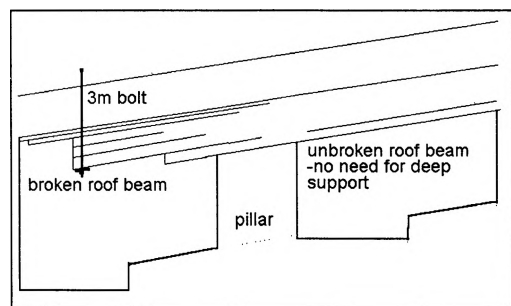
Schematic cross sections showing broken and unbroken beam geometry.
